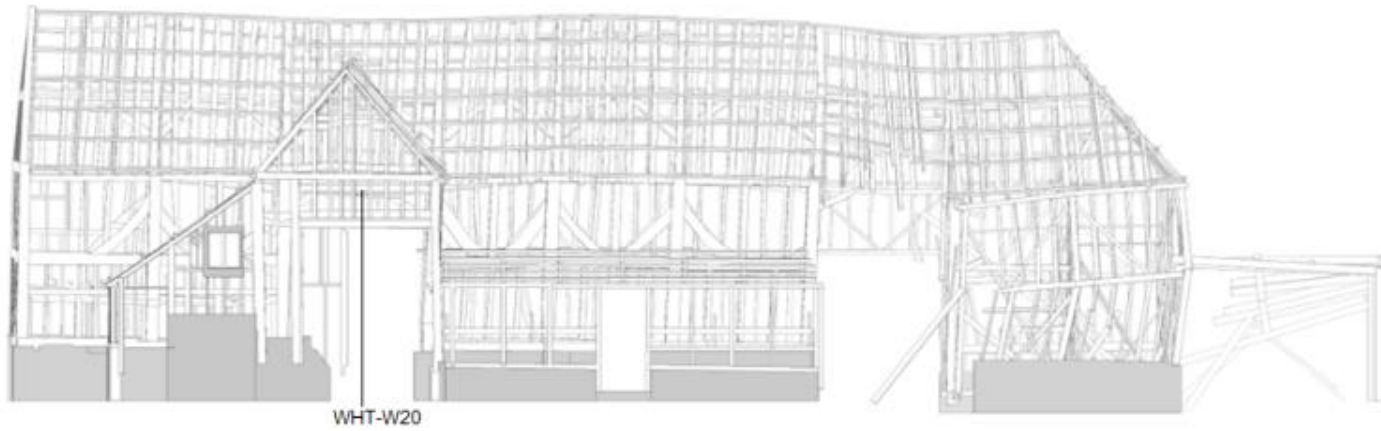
South elevation, showing the location of sample WHT-W20 (after ATD London Ltd)
